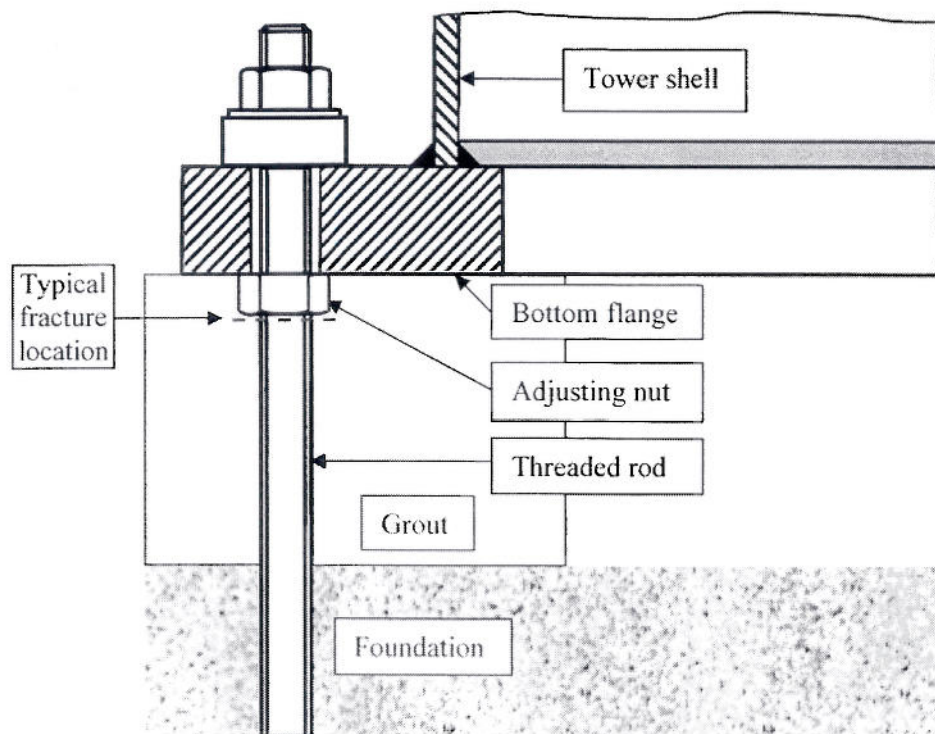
Sketch of bottom flange arrangement showing typical fracture location.
